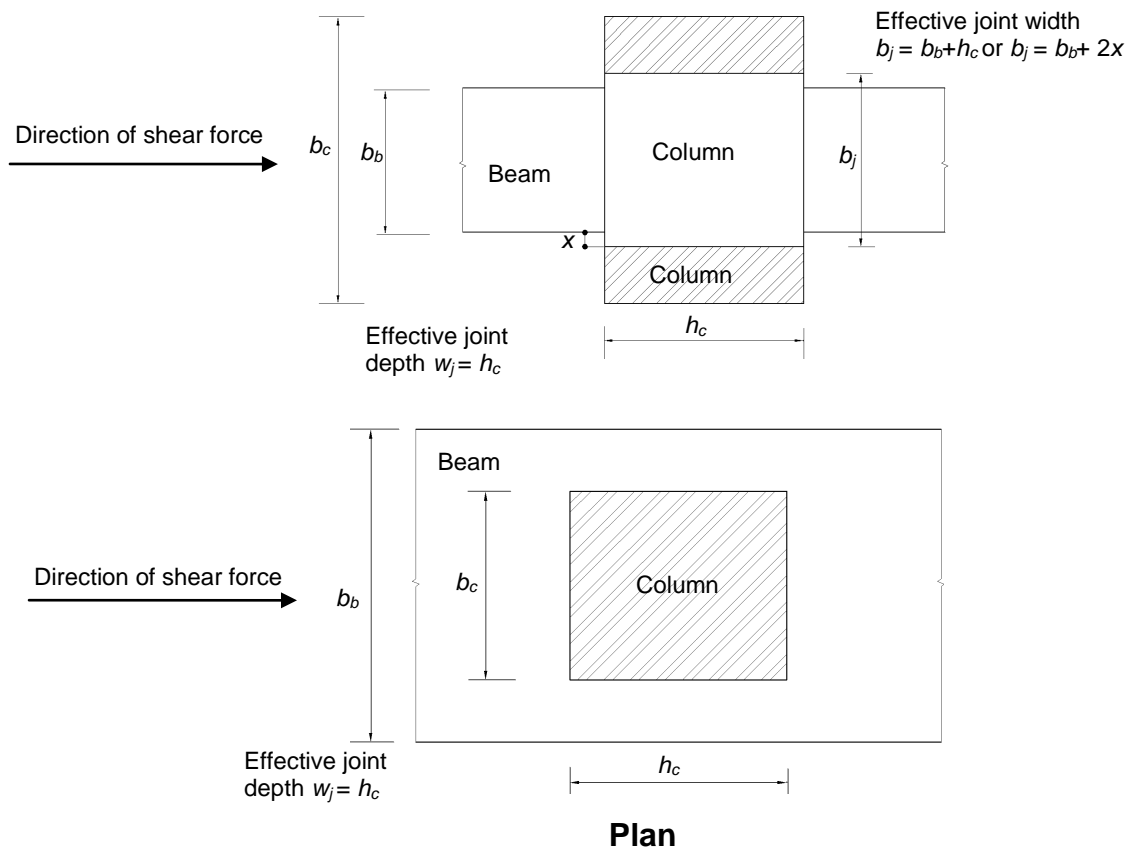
(A) PLAN VIEW OF A BEAM COLUMN JOINT SHOWING EFFECTIVE BREADTH AND WIDTH OF JOINT
